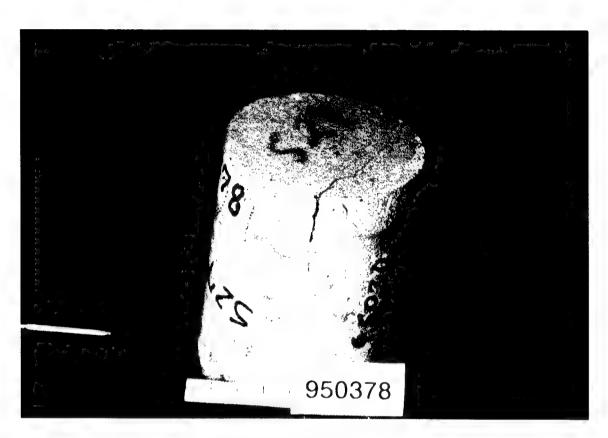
Vertical crack in sample 950378 goes to the surface of the concrete
